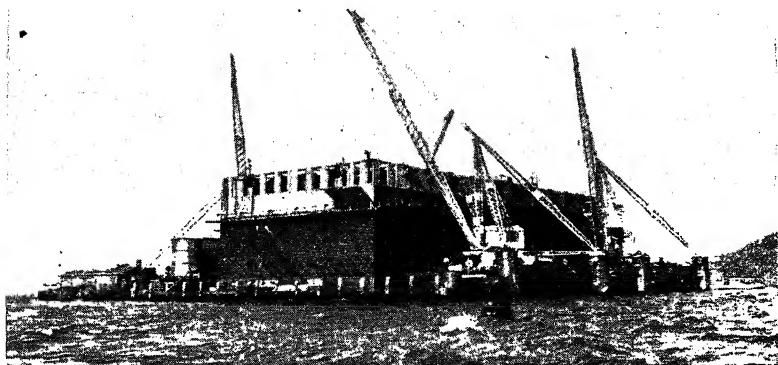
Caisson for San Francisco-Oakland Bay Bridge pier.
